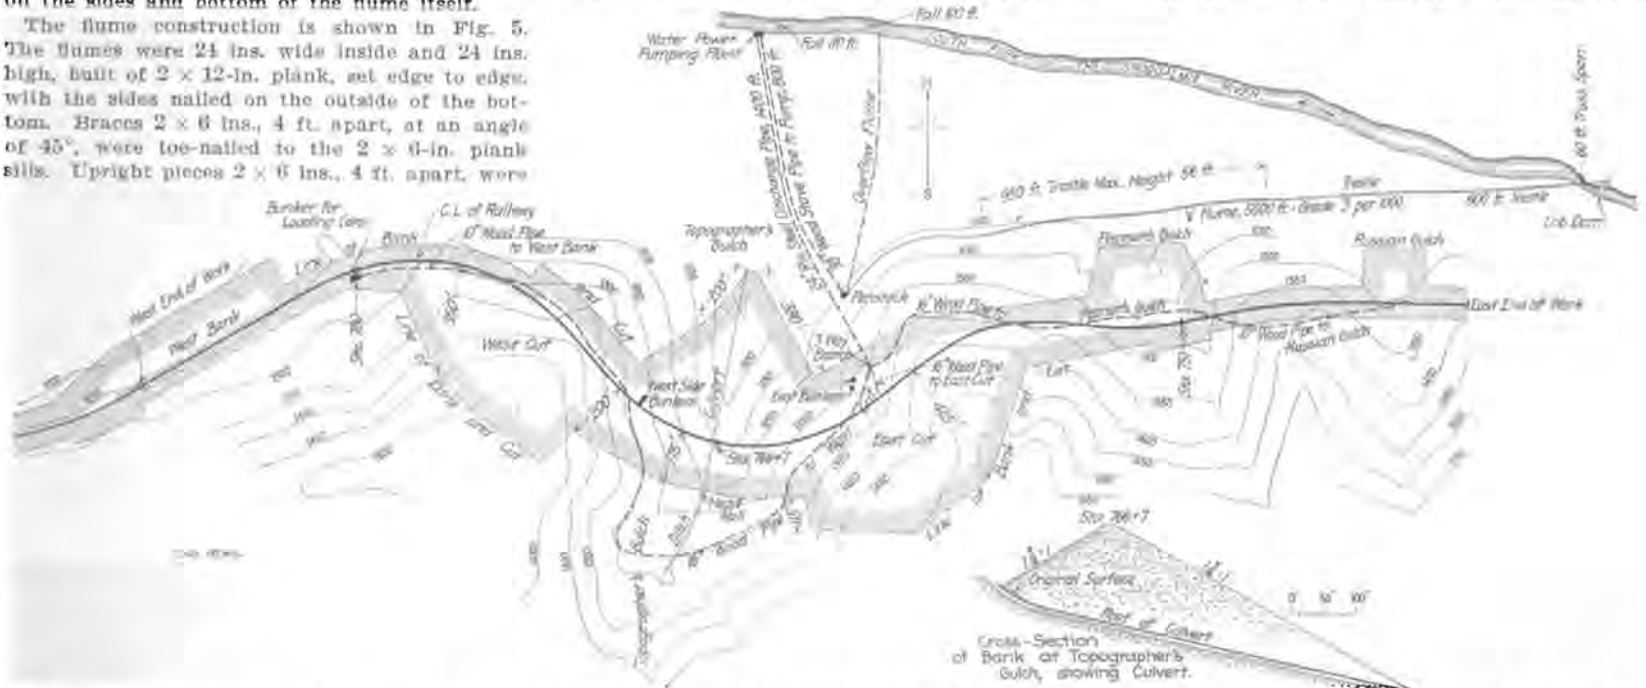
PLAN OF BANKS AND CUTS FORMED BY HYDRAULIC EXCAVATION AND SLUICING, AND ARRANGEMENT OF THE WATER SUPPLY SYSTEM FOR THE HYDRAULIC WORK; CHICAGO, MILWAUKEE & PUGET SOUND RY.
